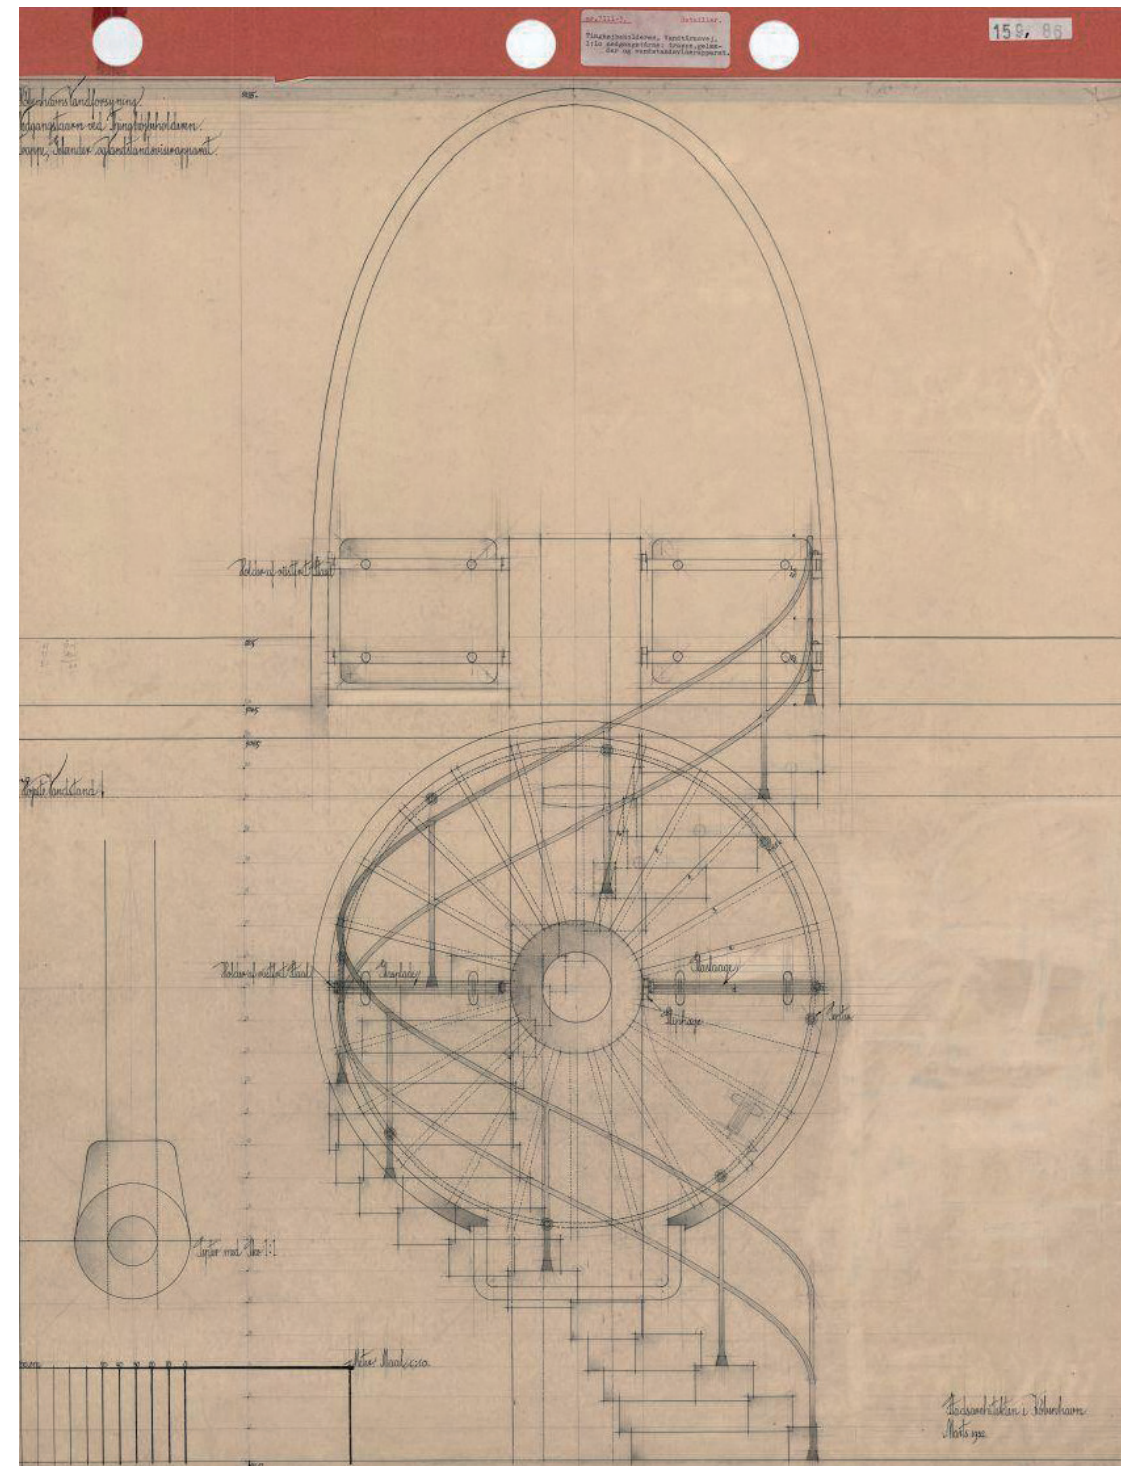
, Plan and section drawing of dome. Draw as a furniture drawing, with overlaying views.
